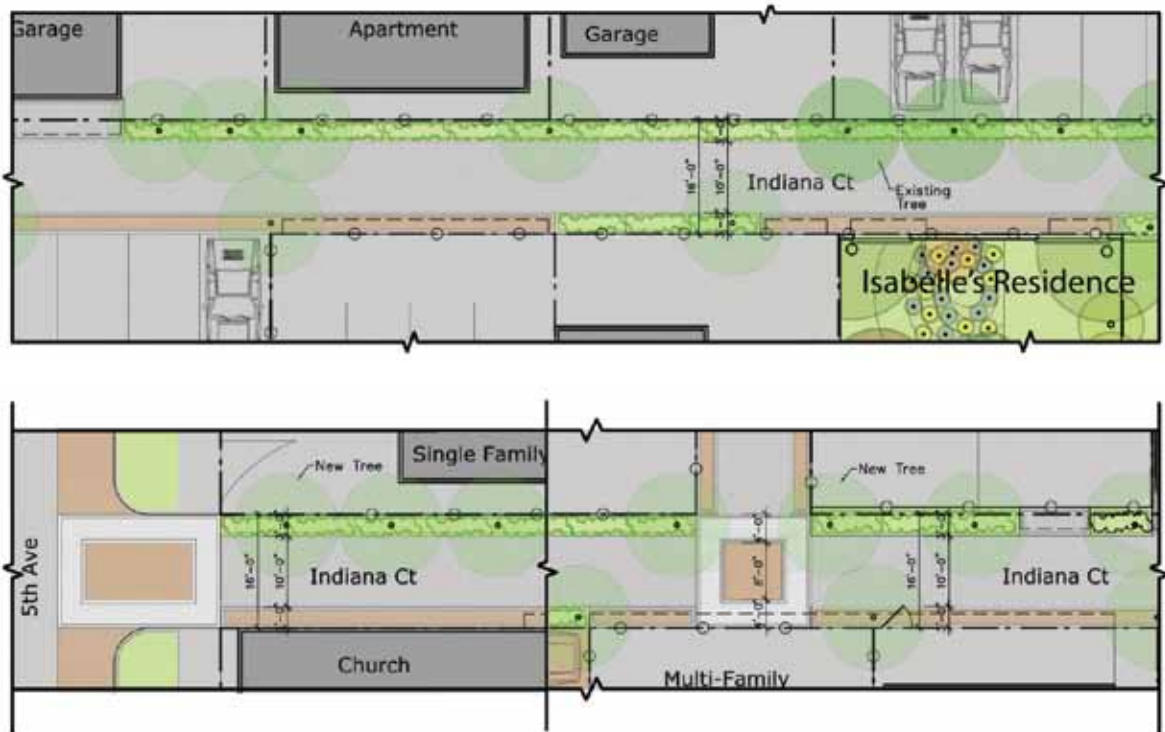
The plan includes improvements such as landscaping, tree planting, permeable paving, and creating places for basketball playing, cycling, and other outdoor, kid-friendly activities.
